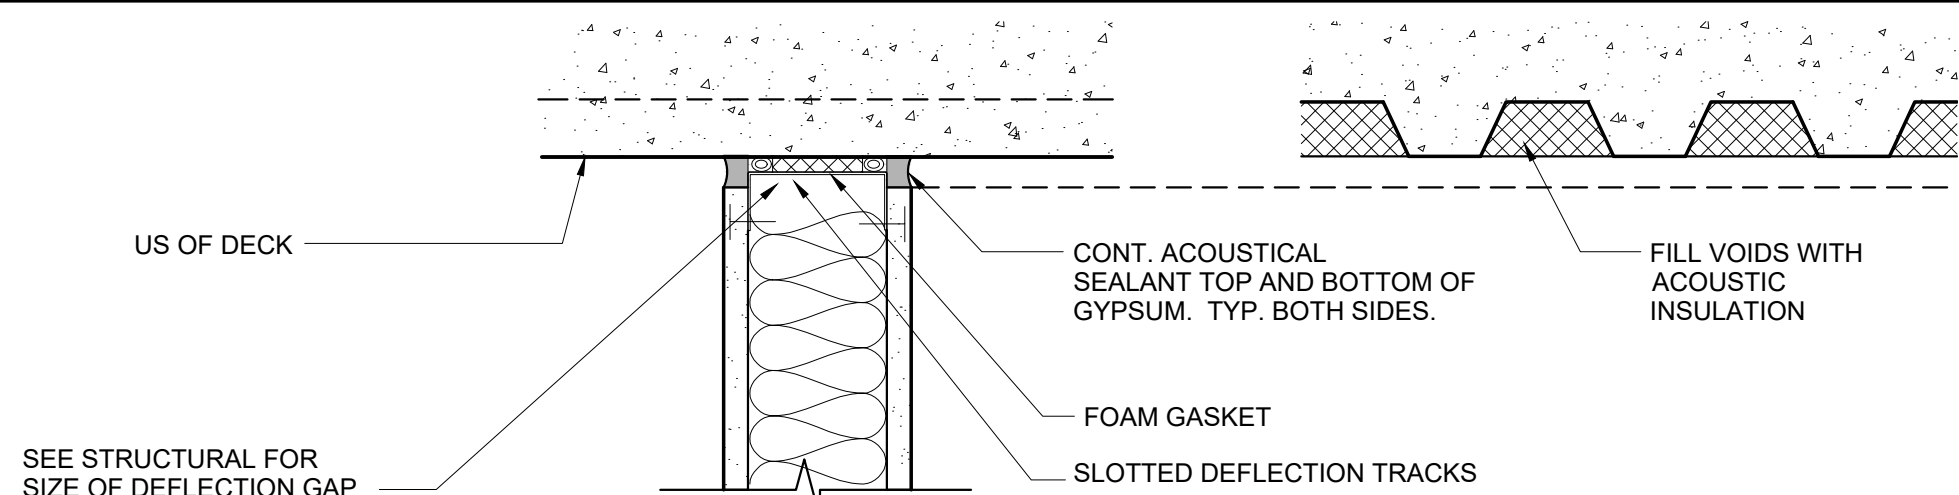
FIGURE A: GYPSUM BOARD PARTITION AT STEEL DECK
